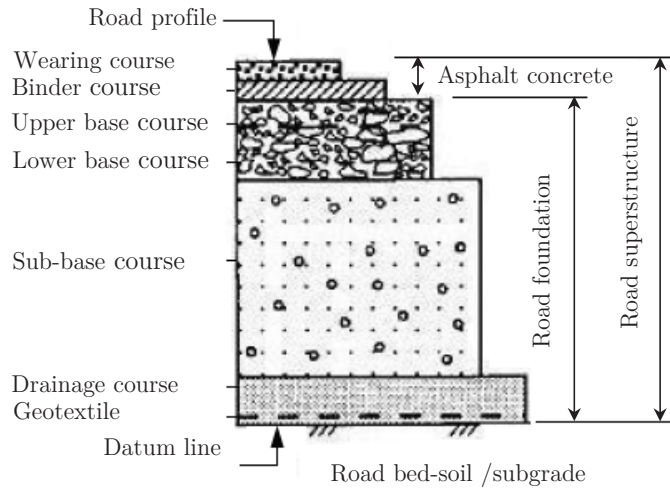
Principles of flexible pavement design in Norway (a typical road section). Adapted from NPRA [84].
